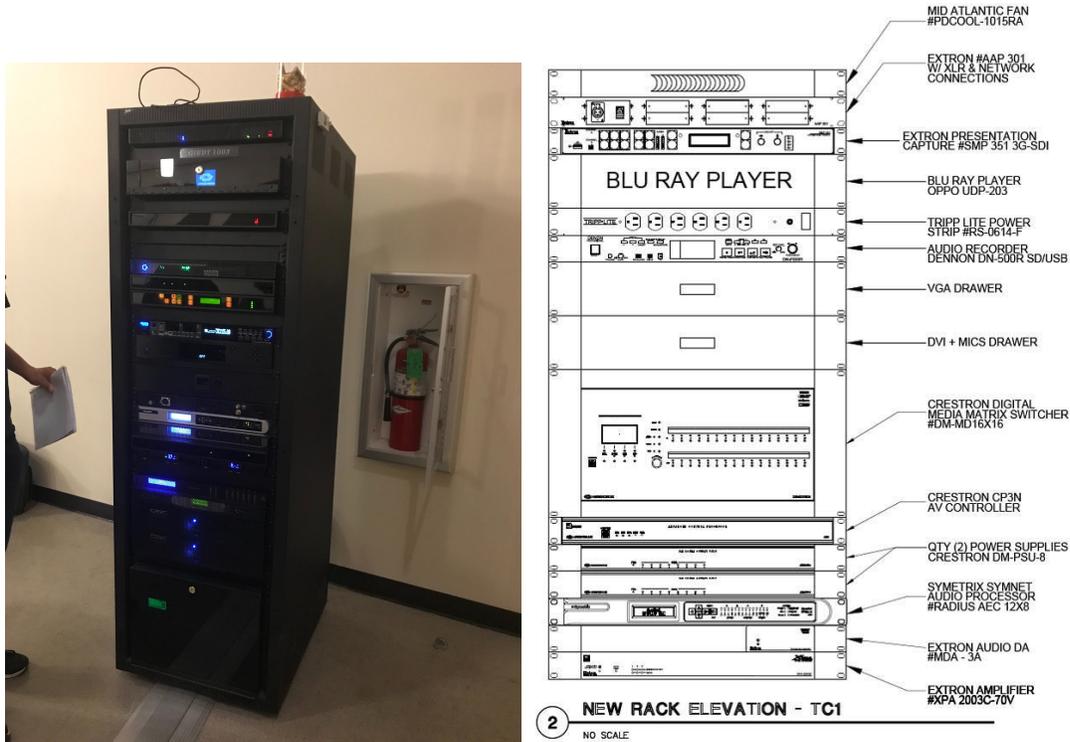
AV rack in Giedt Hall (left) and device breakdown for a typical AV rack from building drawings (right)
